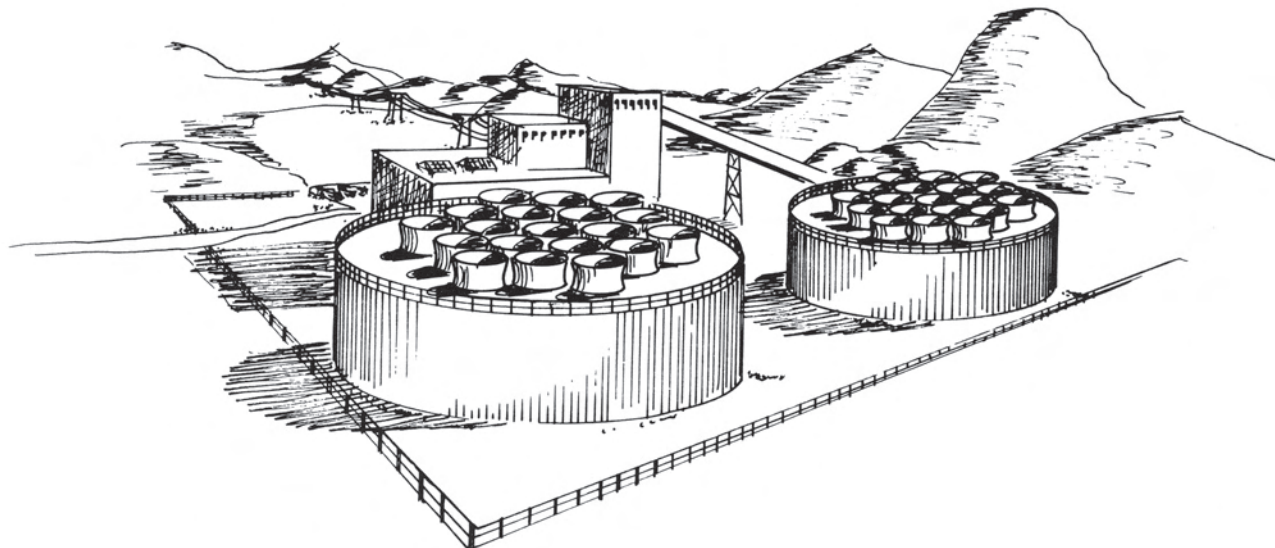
Conceptual dry tower layout at an electric generating plant.
